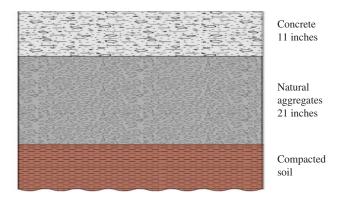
Cross section showing of a typical interstate highway with concrete pavement. Data from Bob Bisgard, Asphalt Paving Company, Golden, Colo., oral commun., 2005.
